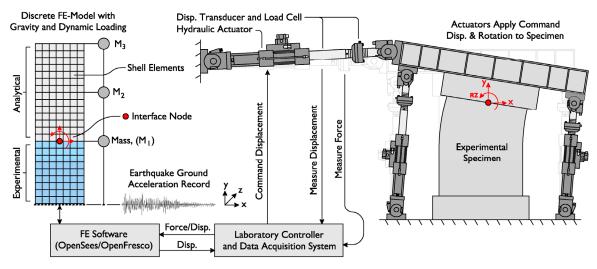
Hybrid test concept for a multi-storey RC shear wall structure.
